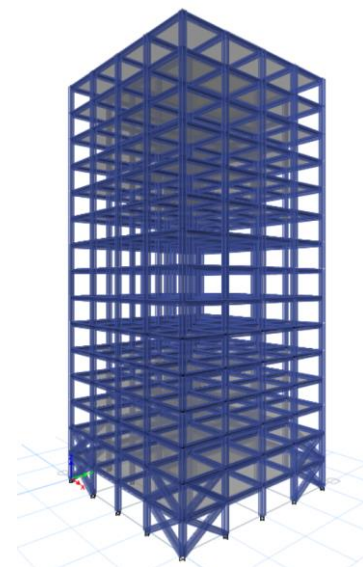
3D rendered view of Model-2 : Structure with concrete Brace at corners
